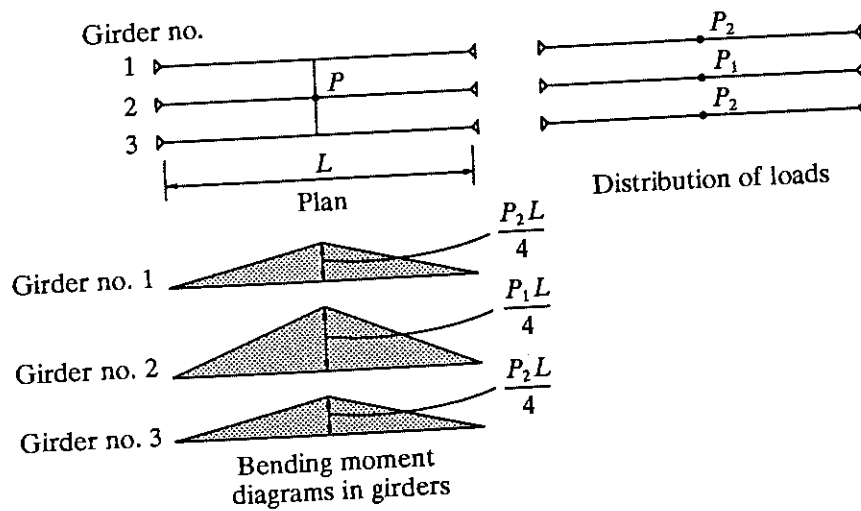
Load Distribution in Girders Connected by One Transverse Beam (from Bakht and Moses (5)).
